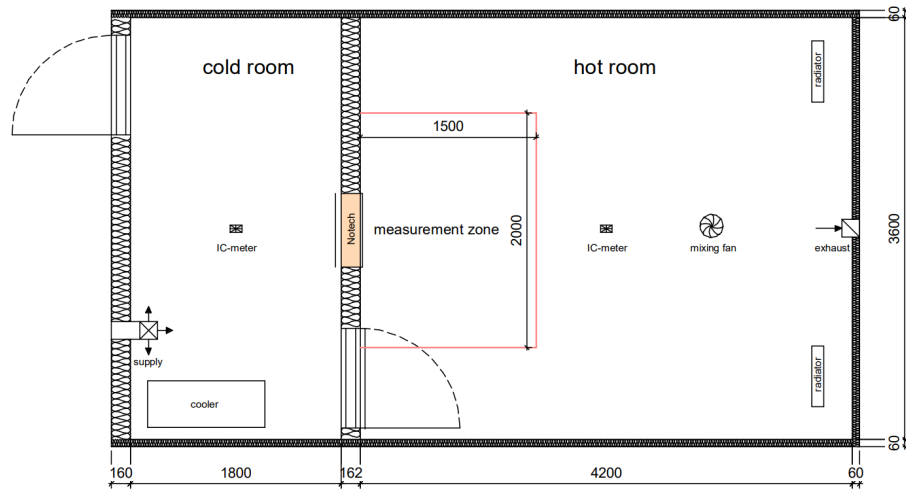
Plan of the laboratory rooms and setup, dimensions in mm
